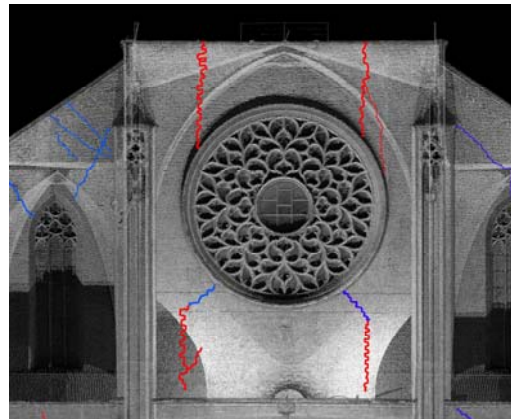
The crack pattern on the exterior façade around rose window
